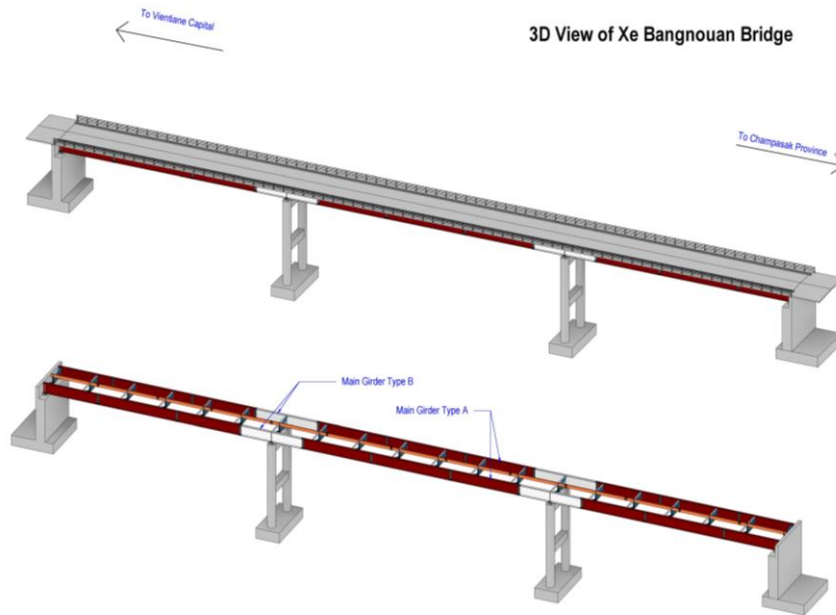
9 Diagram of main steel girder position of Xebangnouan Bridge
